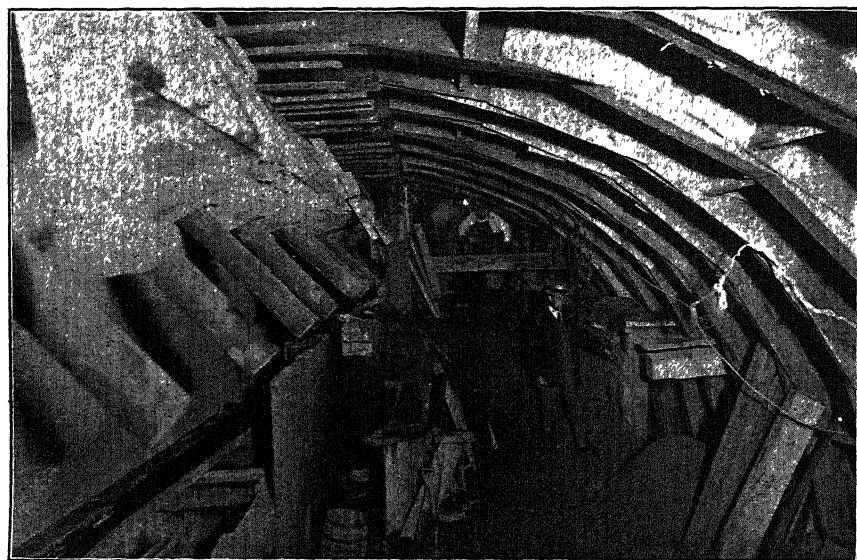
TIMBER ARCH RIBS BETWEEN CONCRETE UMBRELLA AND WALL-PLATE DRIFT.
